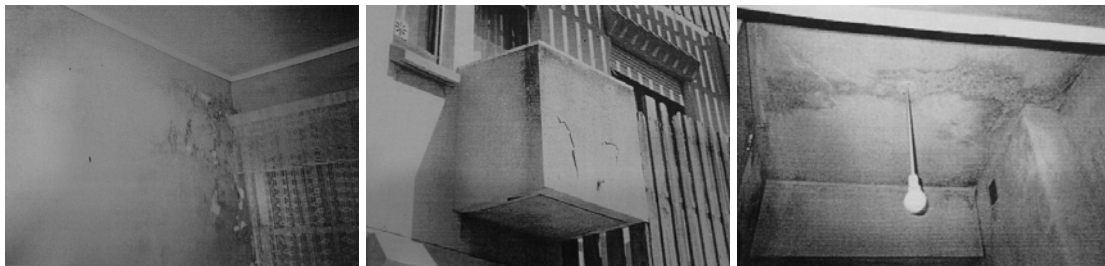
Degradation problems: (a) branched cracking and efflorescence, (b) concrete balconies degradation, and (c) ceiling condensation mold.
